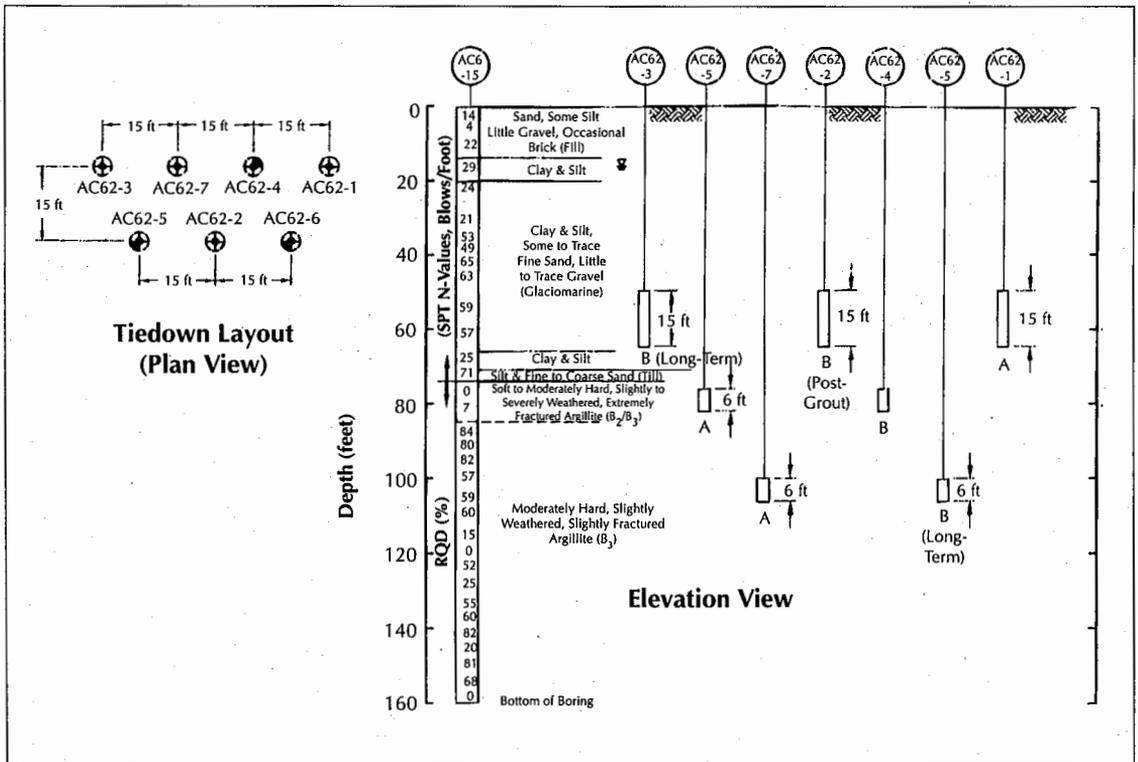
Tiedown layout and subsurface data for Test Site No. 2.
